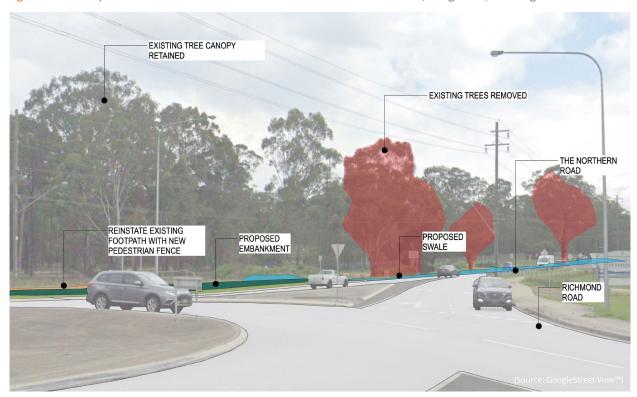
Viewpoint 6 - Intersection of Richmond Road with The Northern Road (facing south) - Proposal view
